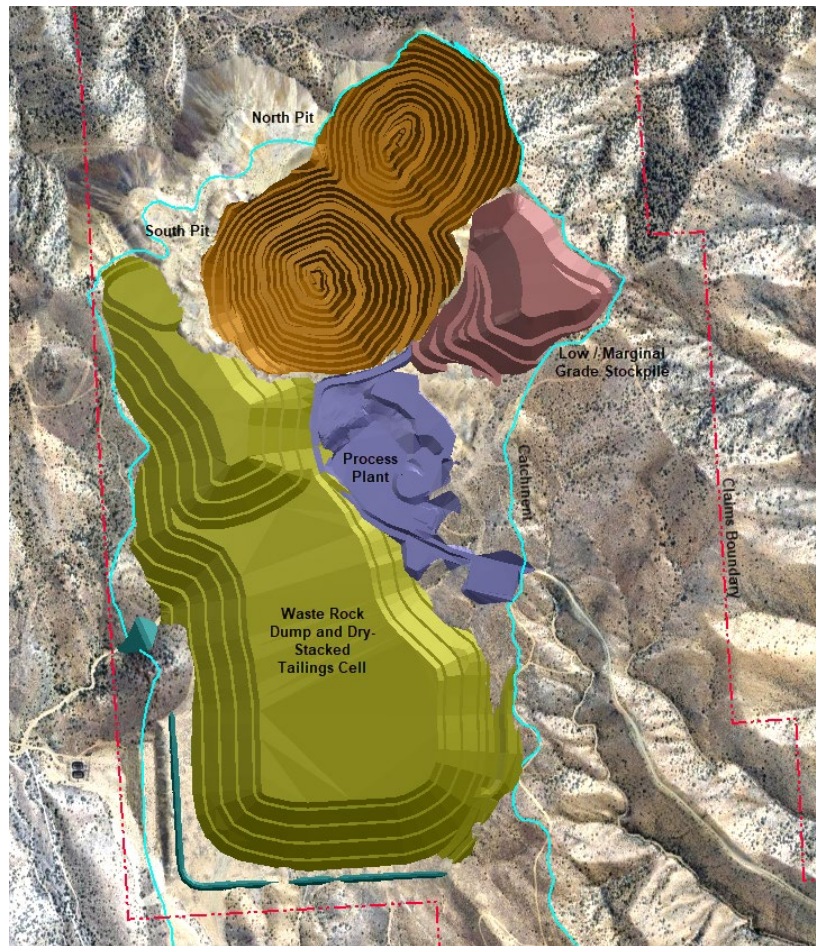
Mine design – plan view of final open cut, northern end of waste rock and tailings emplacement, and site infrastructure
